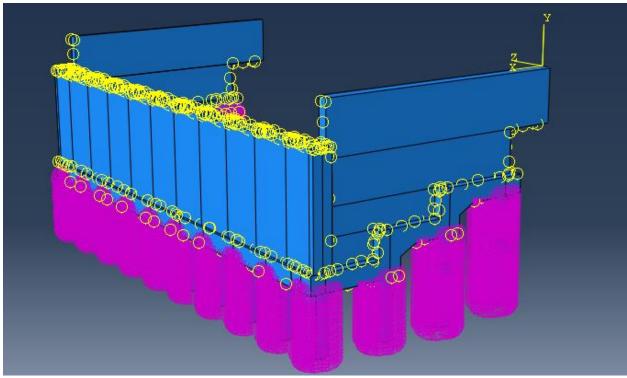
Linear springs (yellow and pink) surrounding the drilled shaft and tie connection between the abutment, wingwall, footing and drilled shafts.
